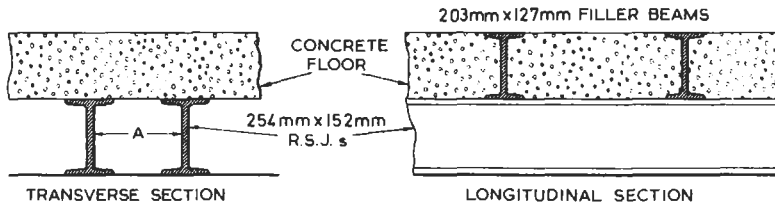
Design of reinforced concrete floor. For the old joists A was 7 in (178 mm) leaving a 1 in (25 mm) gap between the toes; for the new joists A was increased to 18 in (457 mm)
